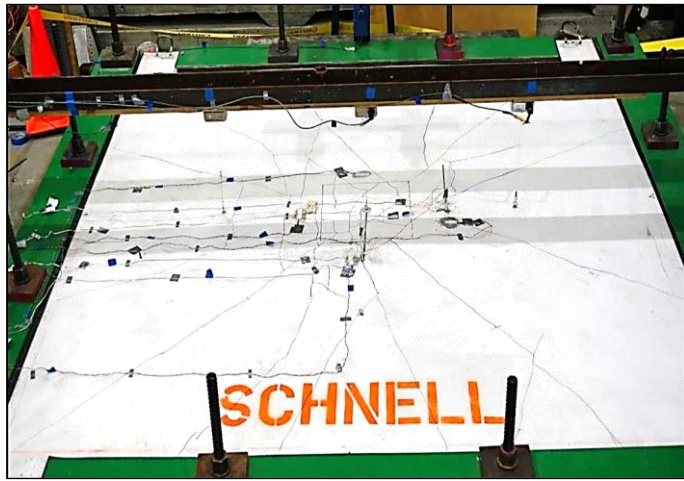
Cracks Pattern for Sandwich Slab Specimen A
